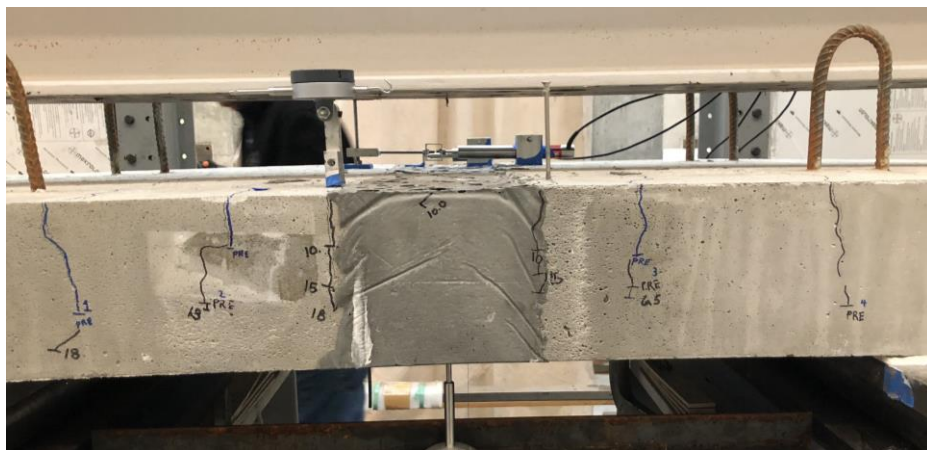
Photo. Cracks surrounding UHPC joint on north face at 15 kips.
